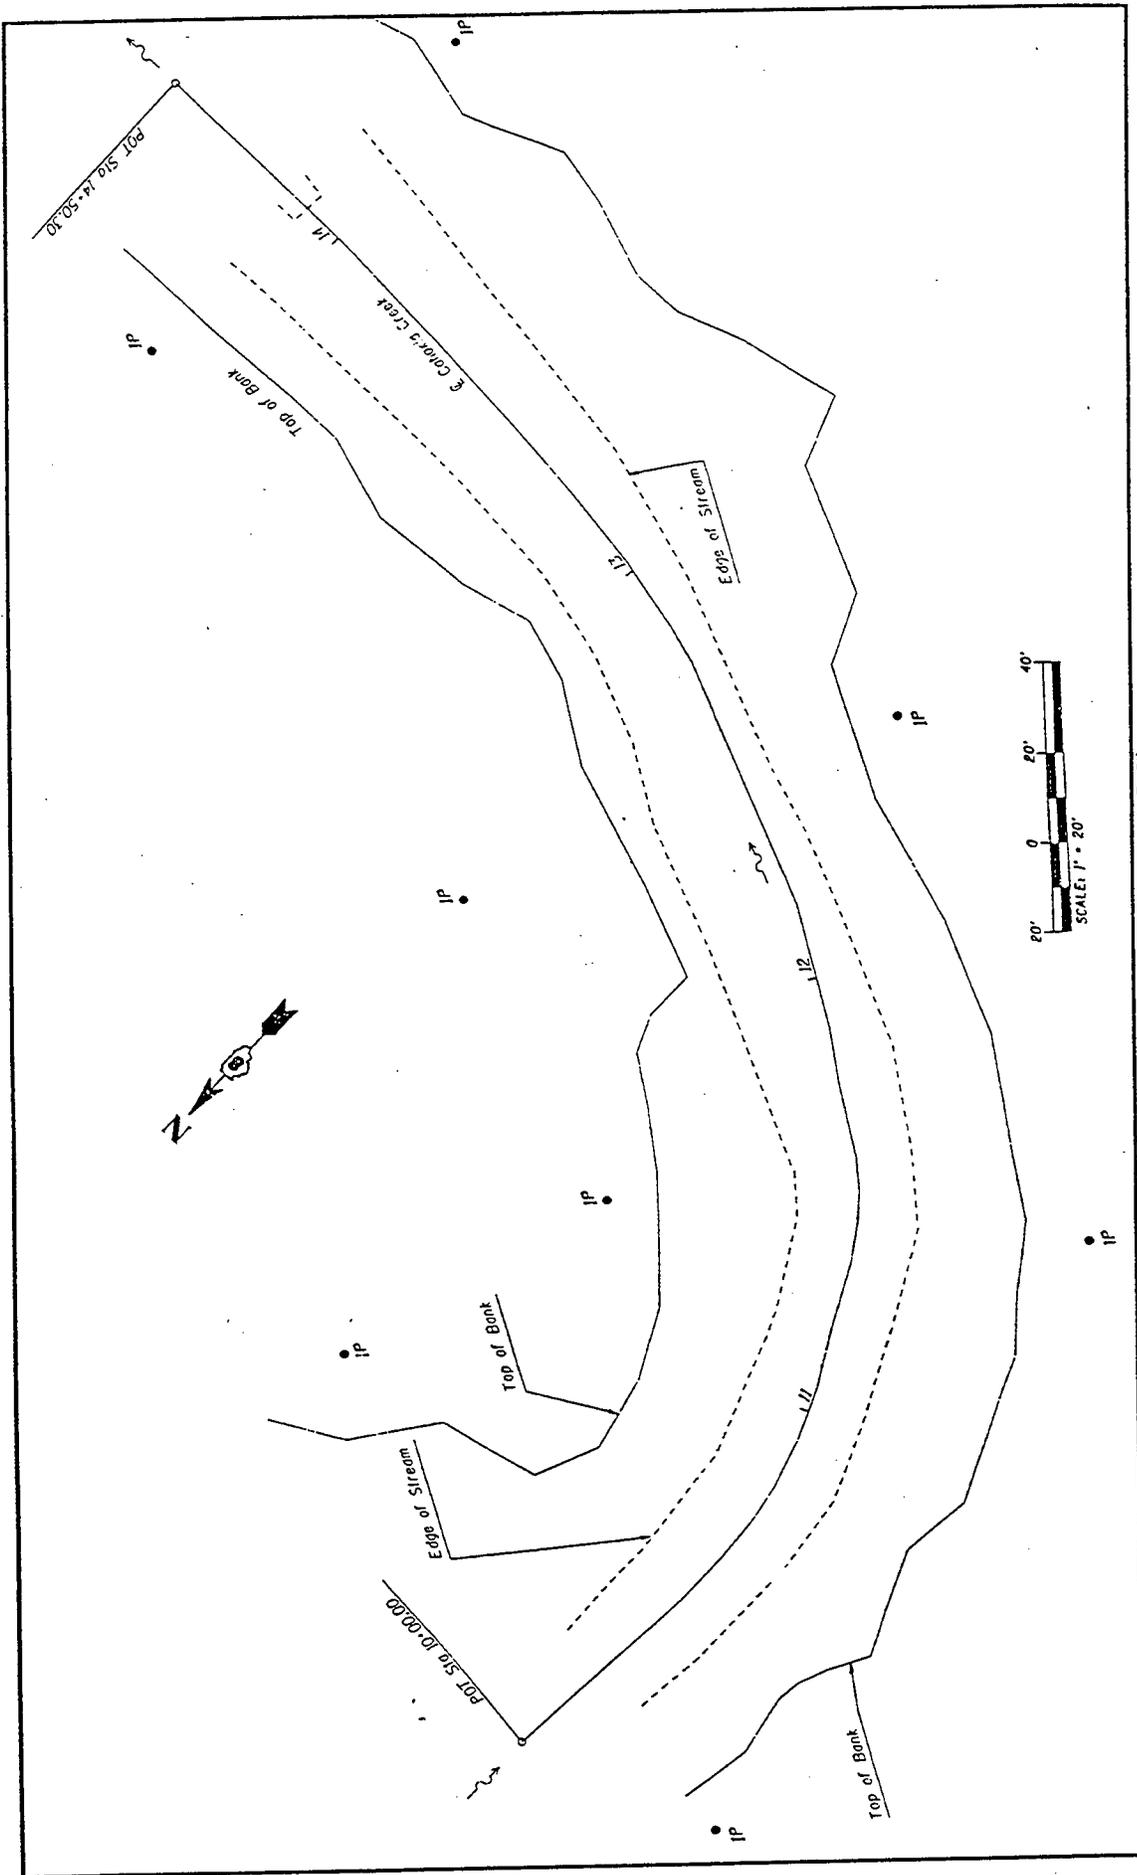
Plan survey of Cahokia Creek, July 1996. (Source: IDOT)
